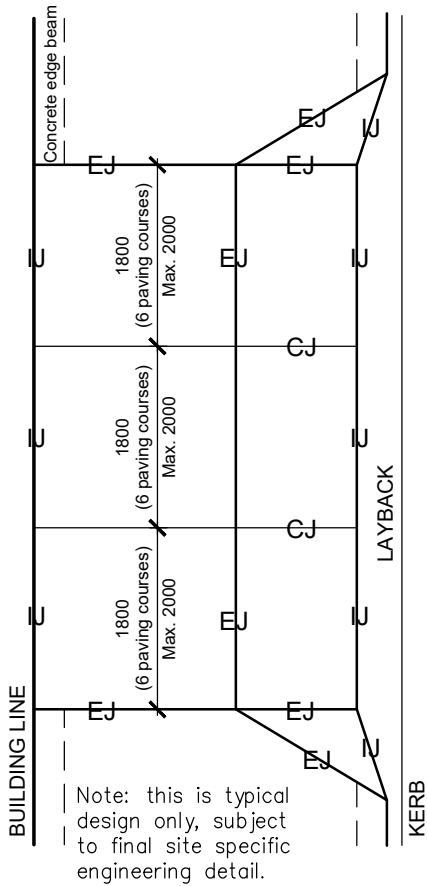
Typical Vehicle Crossing Paving Layout_Full Granite Treatment
